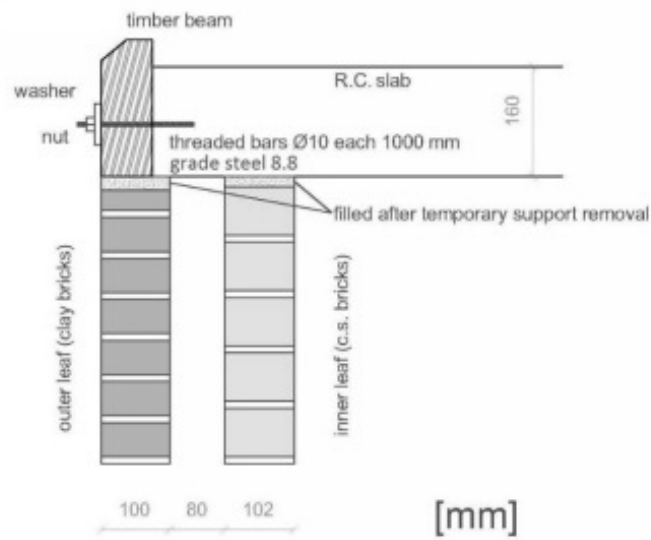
Detail of the connection between the r.c. slab of the second floor inner leaf (c.s. walls) - East and West side.
